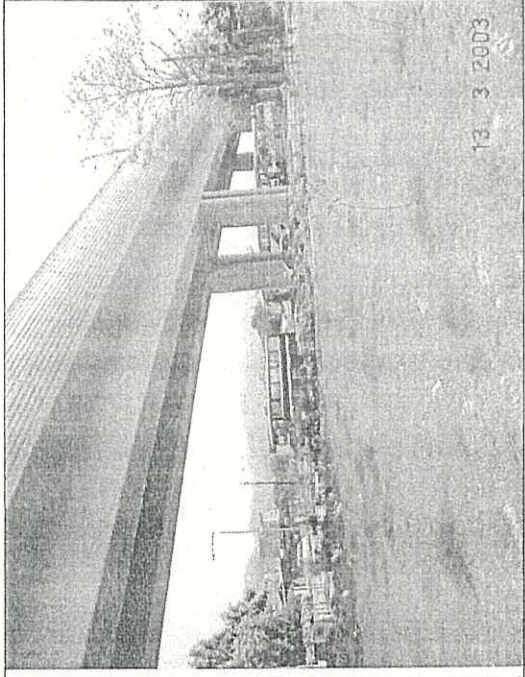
Landscape Planting at Tin Sum Tsuen (Piers 848-852)
